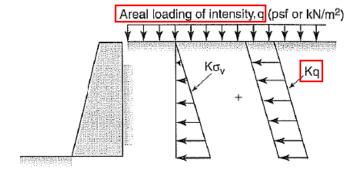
Influence of <u>areal loading</u> on wall pressures.
